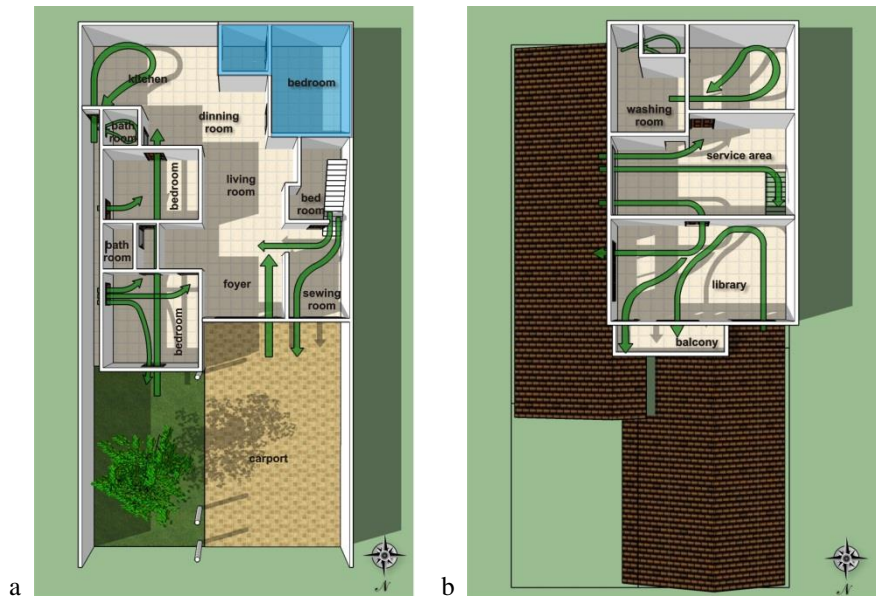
(a) Existing layout on 1st floor; (b) 2nd floor
